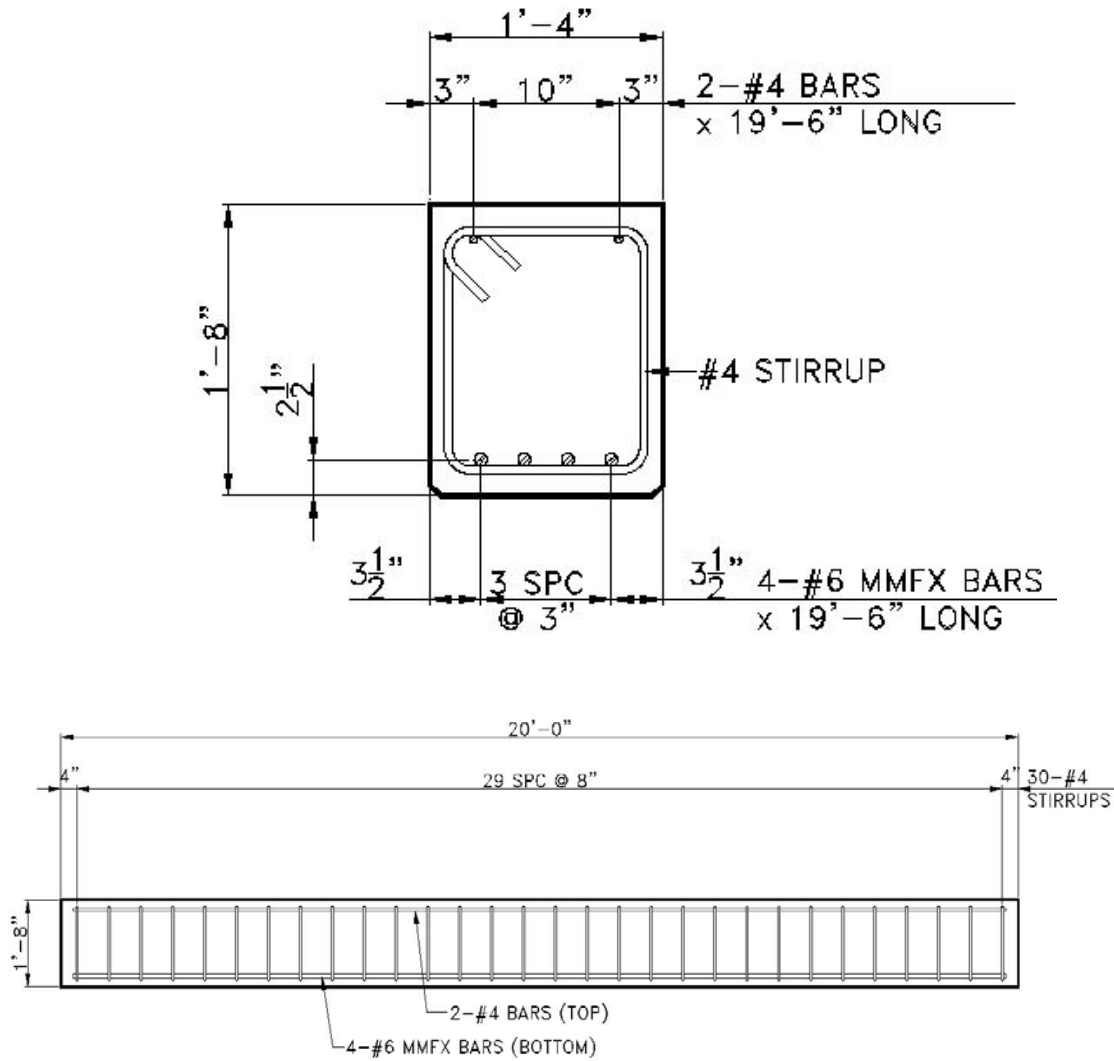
Cross Section and Elevation of MMFX4 Beam [McNally, 2003]
